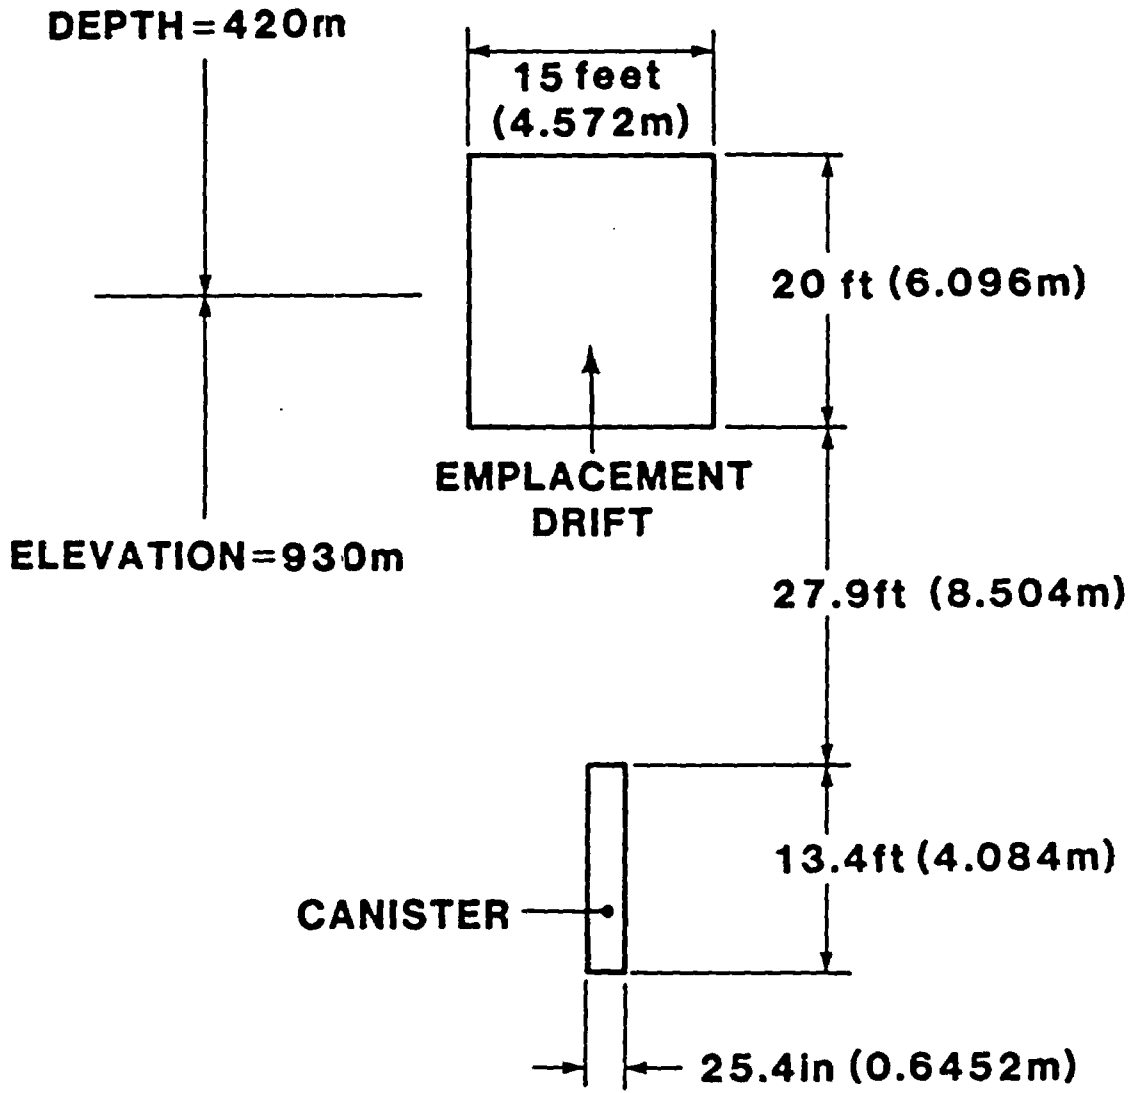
Cross-Section of the Two-Dimensional Model for Emplacement Scheme 2 showing Dimensions of the Emplacement Drift and Canisters
